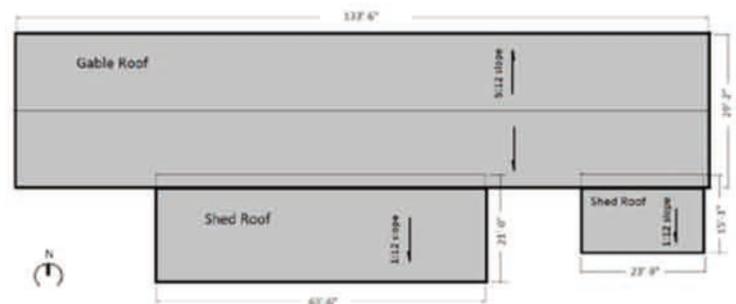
Building 84 – The Open Bays on the North Wall and the Layout of the Roof
